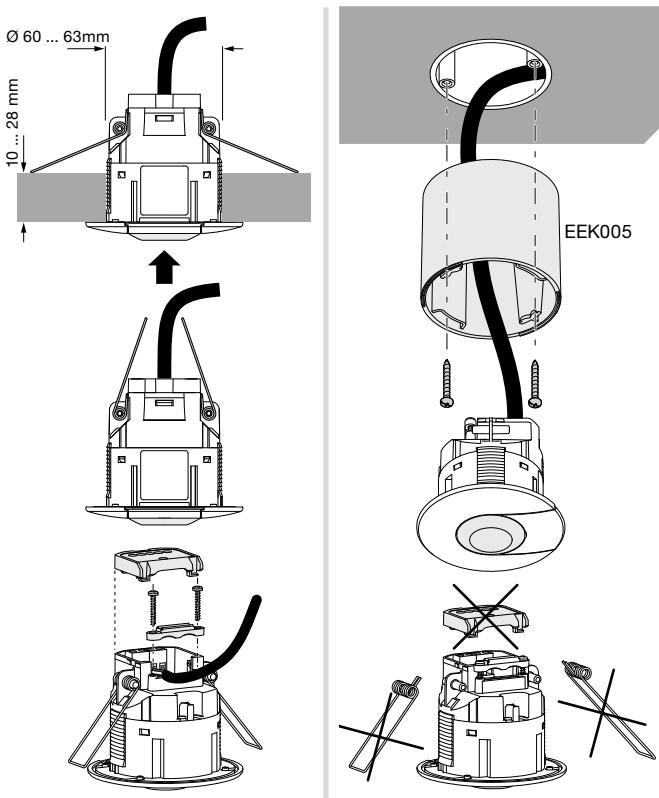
Installation in suspended ceiling / in wall-mounted housing EEK005
